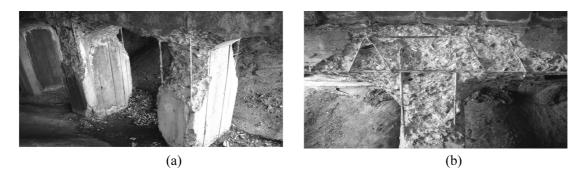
Damages of spandrel arch piers: (a) Spalling of concrete of pier cap beam, (b) Spalling of concrete of pier
